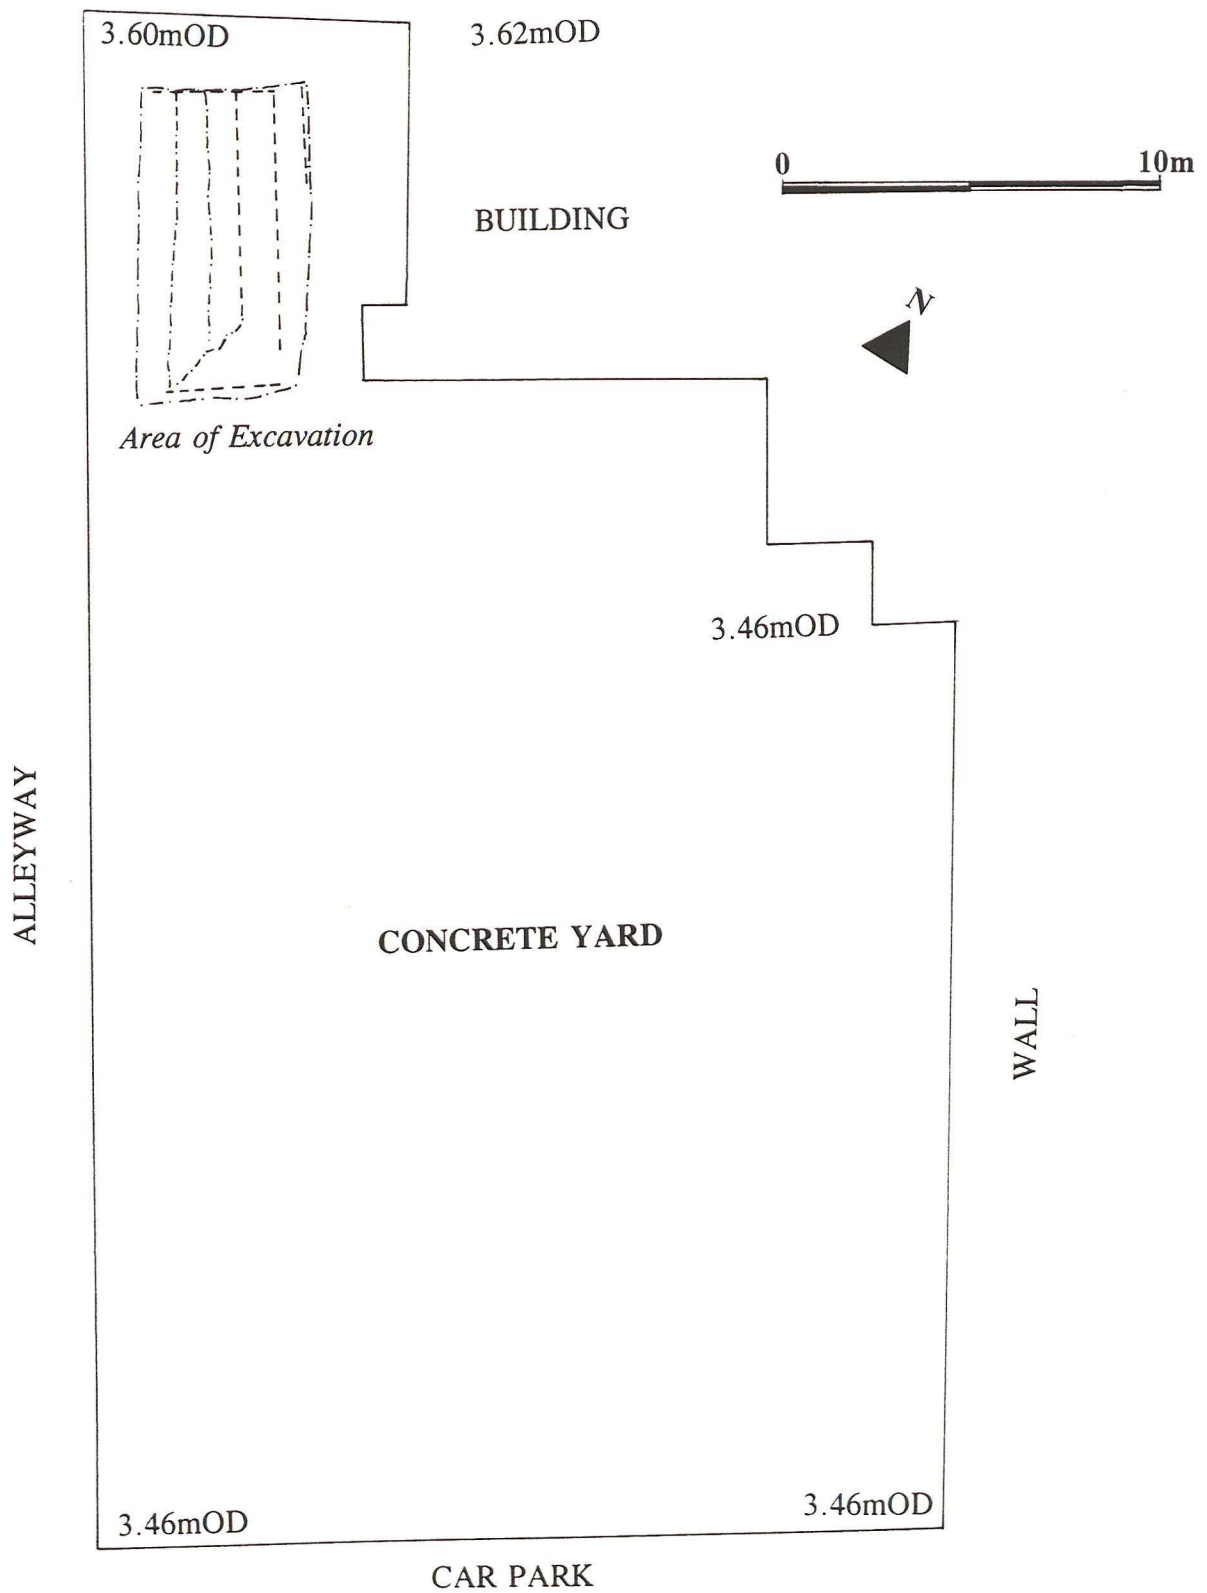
PLAN OF SITE SHOWING AREA OF EXCAVATION (SCALE 1:200)
